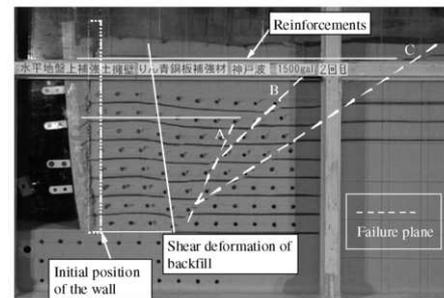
Failure plane formation and backfill deformation (in test PB)
